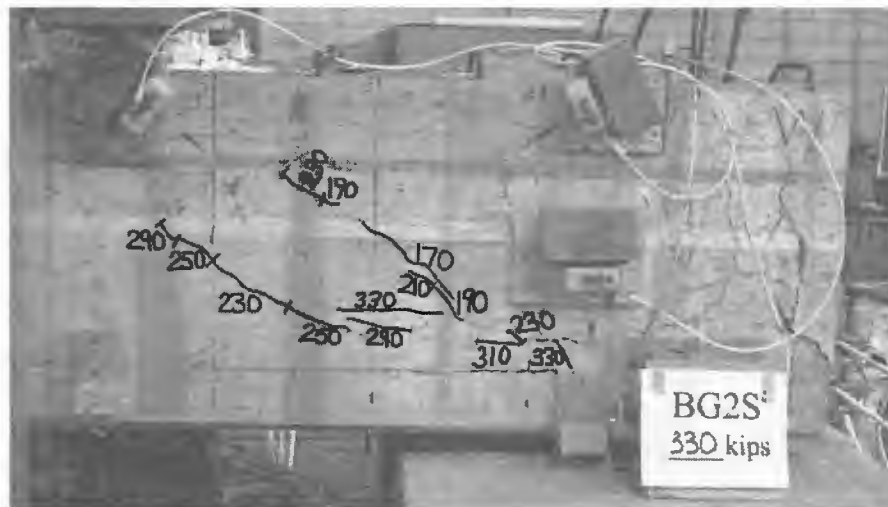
Shear-induced cracks on the west face of BG2S under a load of 330 kips (1470 kN)
